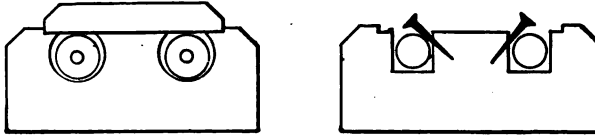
Cross-sections, exact size, Standard three-wire moldings.
